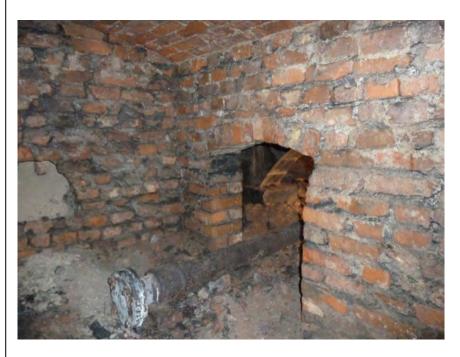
Shot of southern and southwestern walls in Room *C1. Looking southwest.
